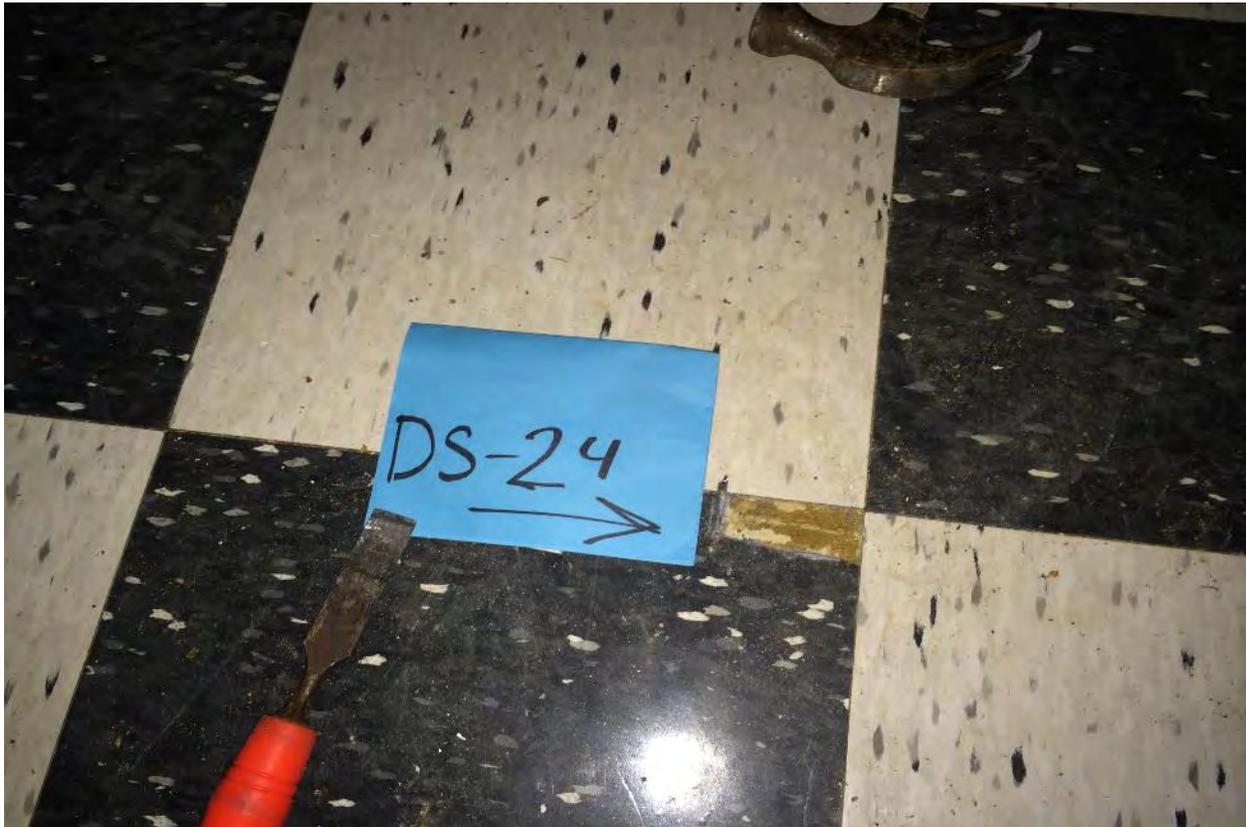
Laboratory analyses did not detect asbestos minerals within the black floor tile or mastic sample DS-24 collected from the Dormitory Building downstairs training room.
